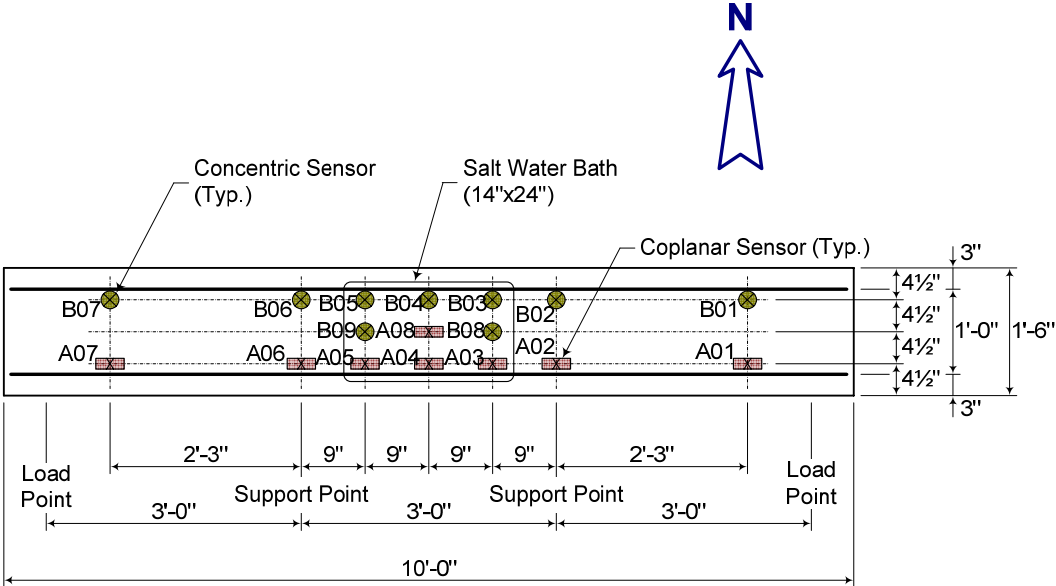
Plan View of Slab 1 (Dickerson 2005)
